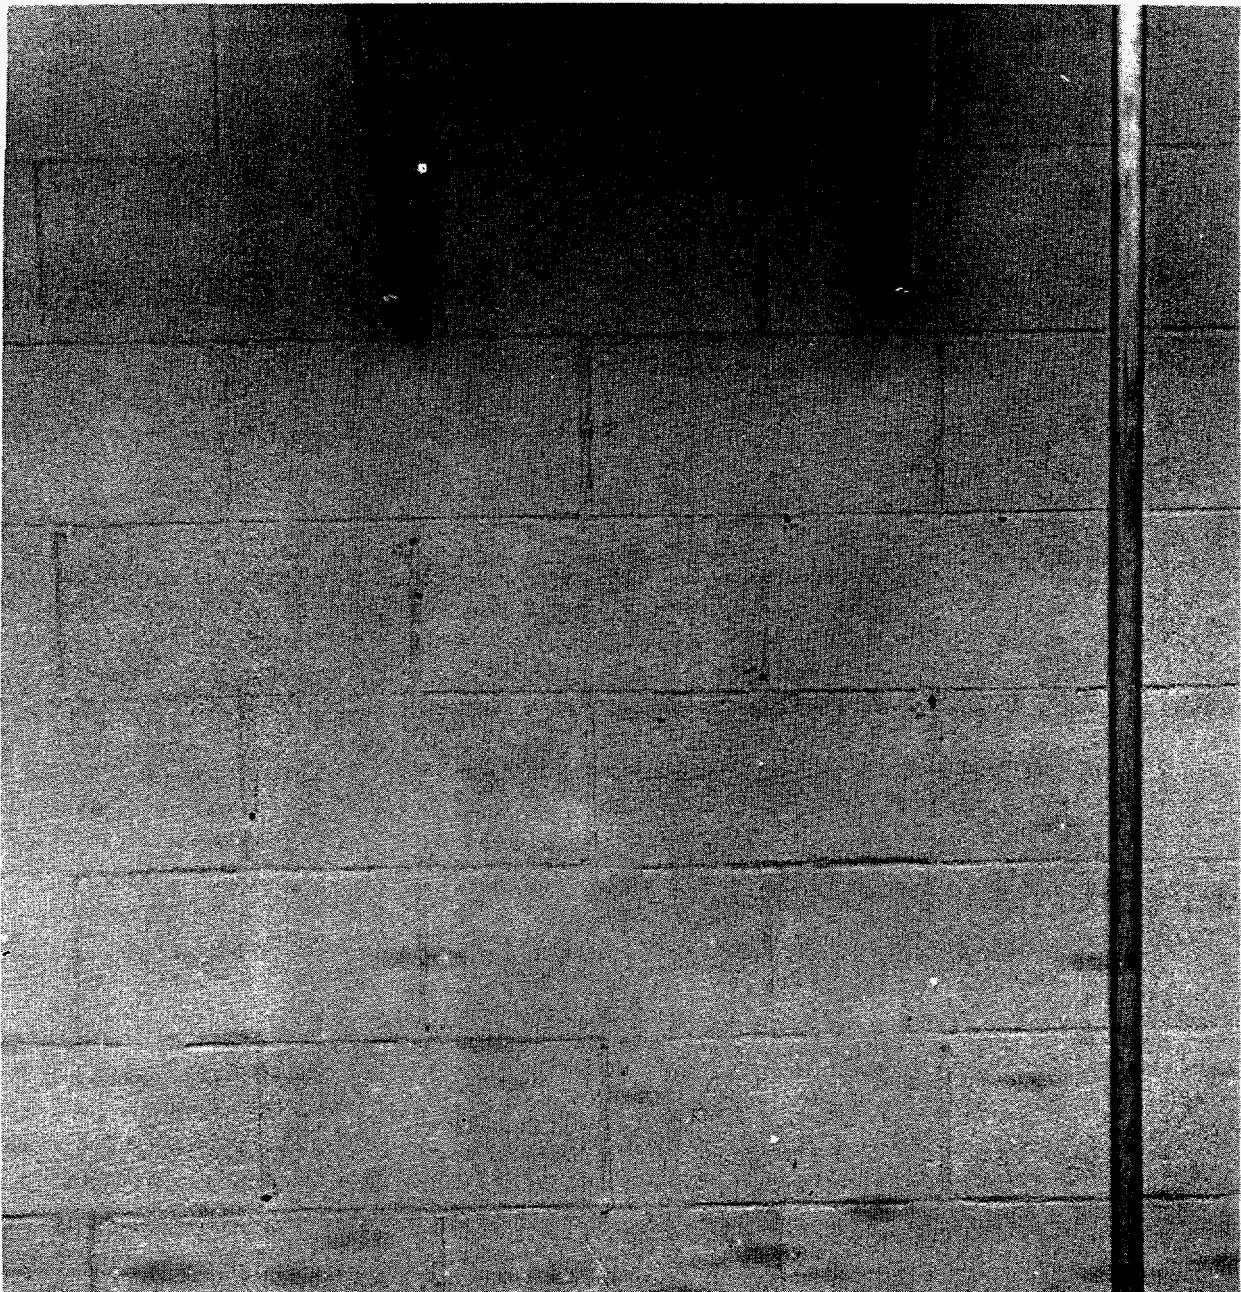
Building 479, extensive cracking under air conditioner, 0.21 cm/sec.
